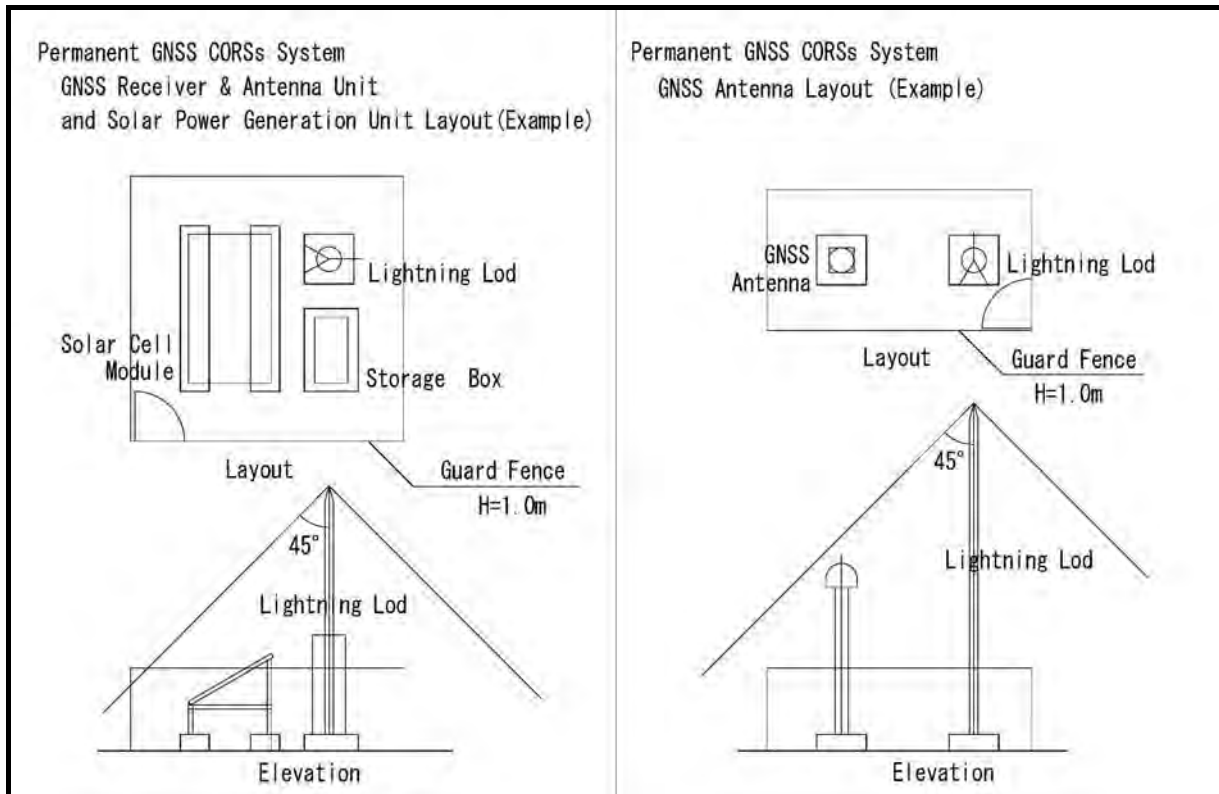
Permanent GNSS CORSS System/Equipment Layout Plan
